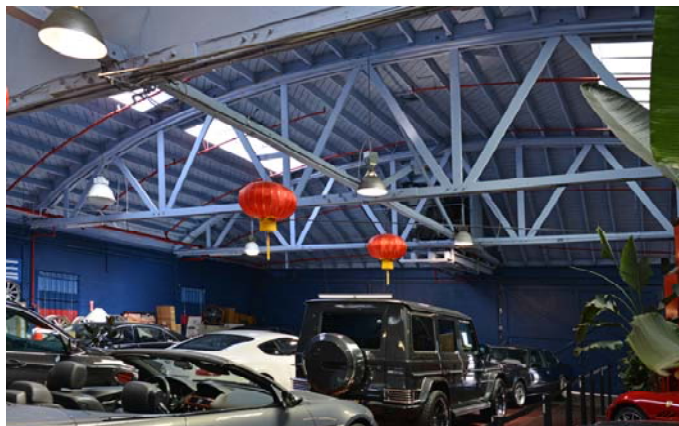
Bowstring trusses on the interior of 1028 Carolan Avenue.
